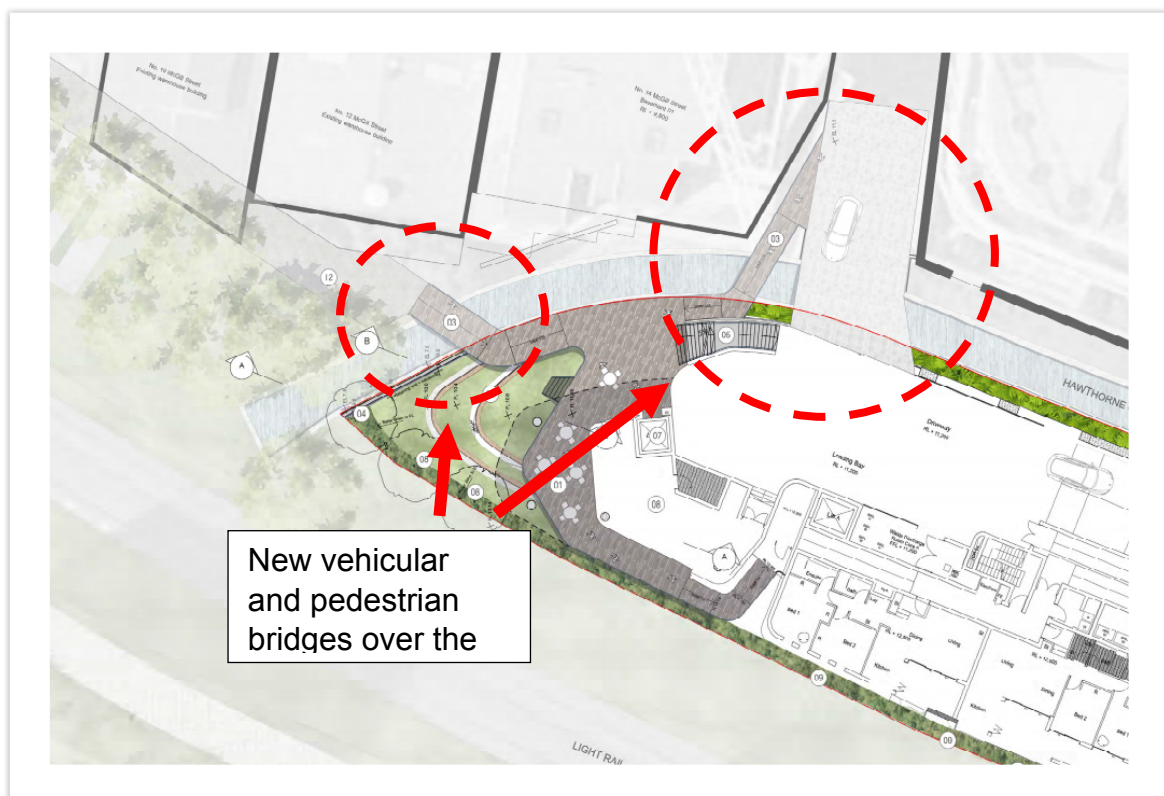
Location of new vehicular and pedestrian bridges to be constructed over Hawthorne Canal.
